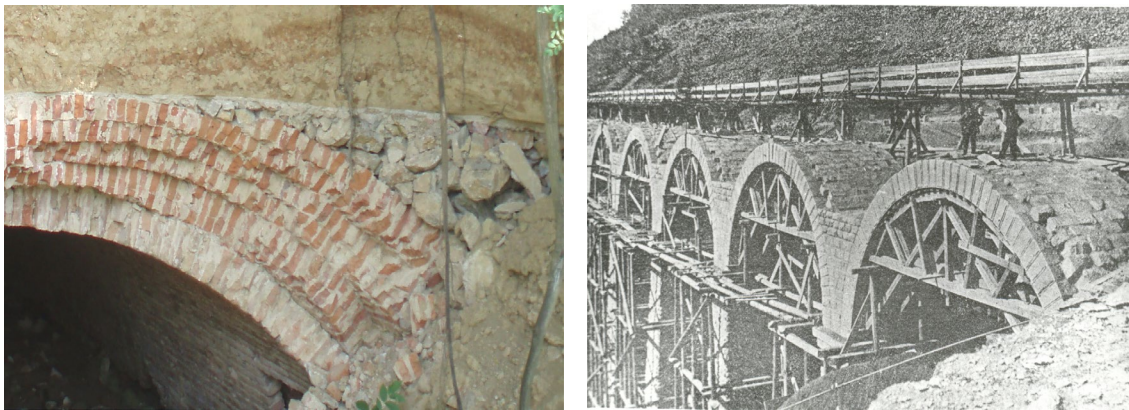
Left: Stone backing of brickwork arch (bridge under demolition, Hungary), Right: Haunching between piers (bridge under construction, Hungary)
